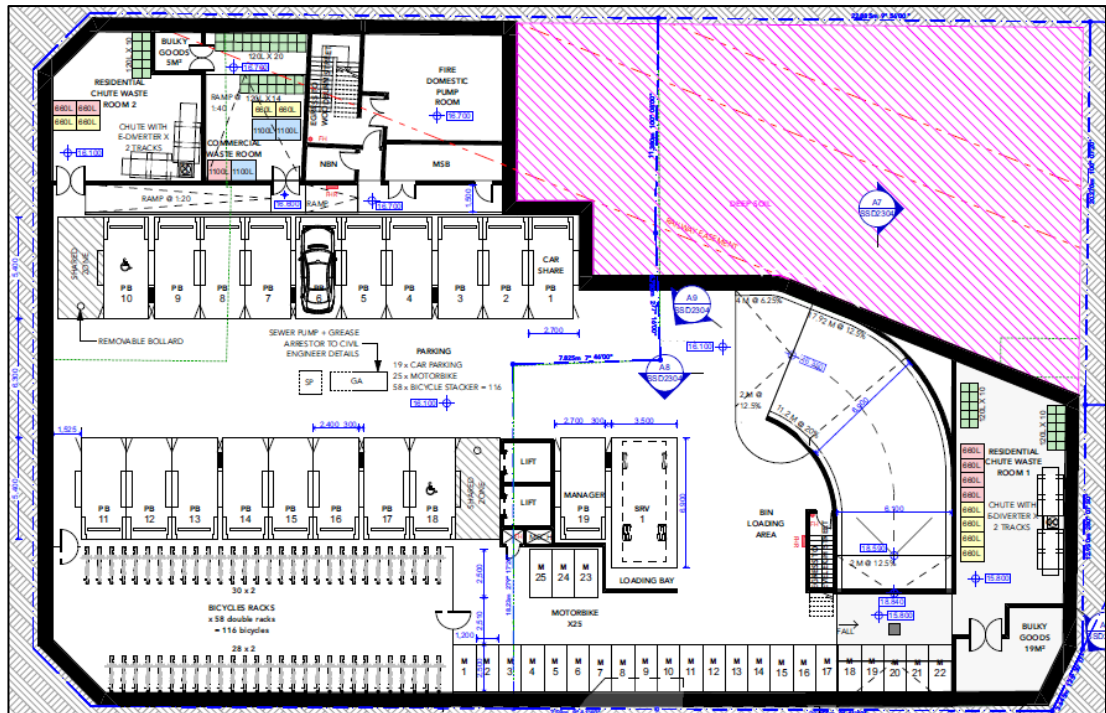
Basement Floor Plan (Source: Mark Shapiro Architects)
